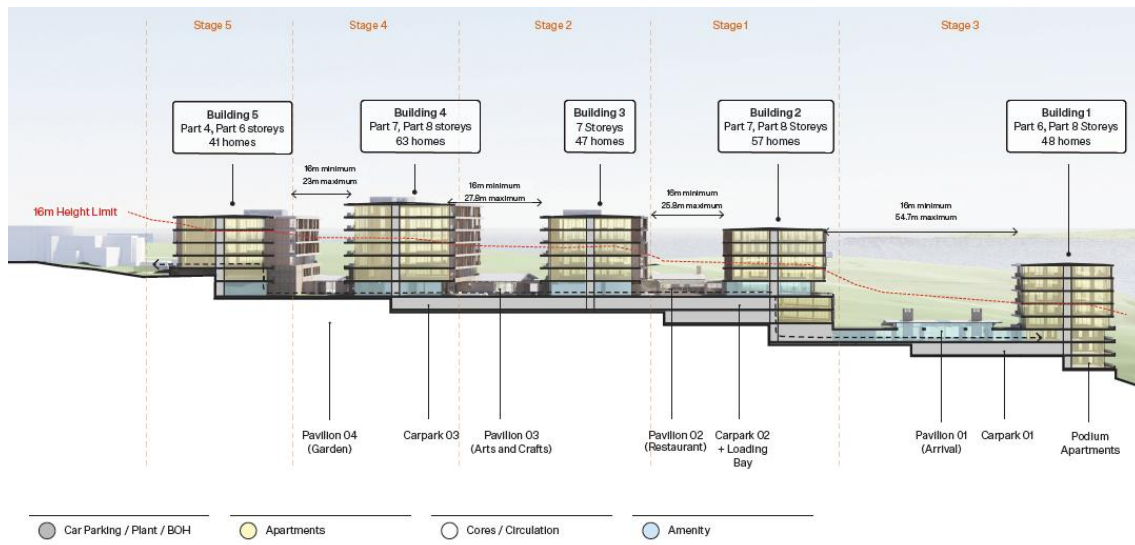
Masterplan Section on the long east / west axis showing the Site topography, the podium base and series of separated upper building forms with their north / south orientation (refer Sheet 30 of the WAM Architectural Design Statement).
